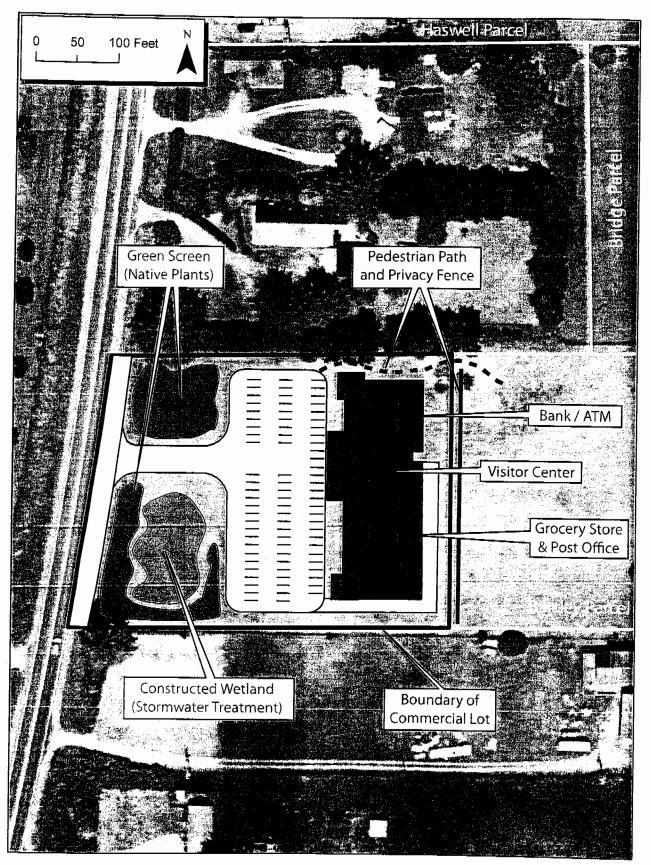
Diagram of Proposed Commercial Buildings and Landscape
